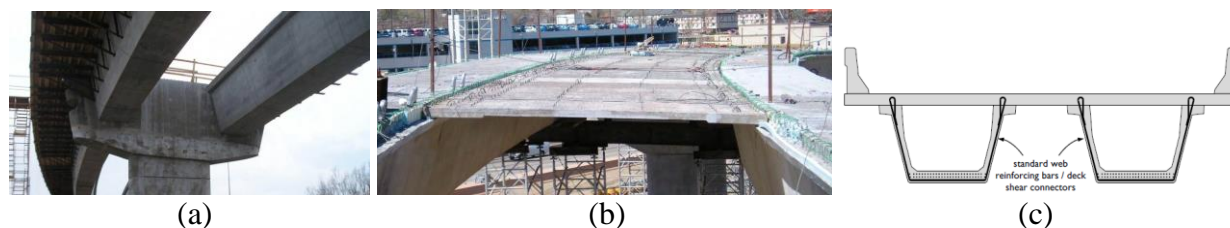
Precast decks with tub girders: (a) before placing (Reese and Nickas 2010); (b) after placing (Reese and Nickas 2010); (c) connectors for composite action (Hovell et al. 2013)
